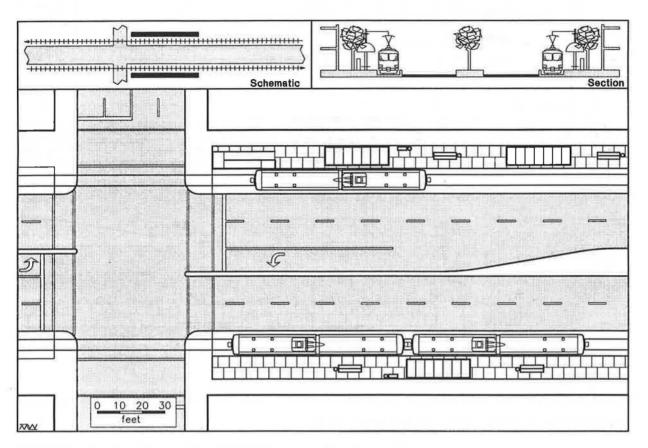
Sidewalk platform station with LRT along both sides of the street.
